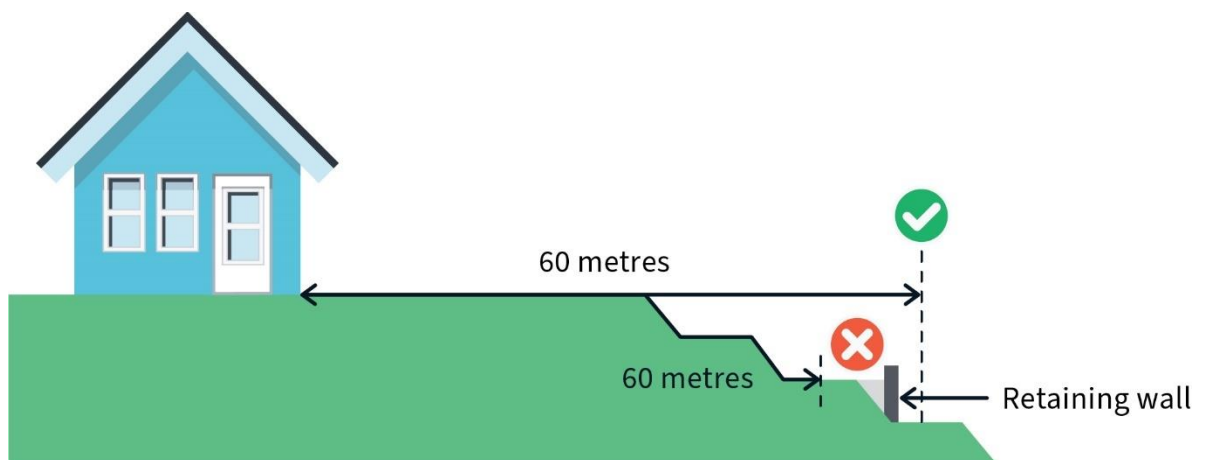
Residential land cover – measurement of the 60 metres – retaining wall cover
